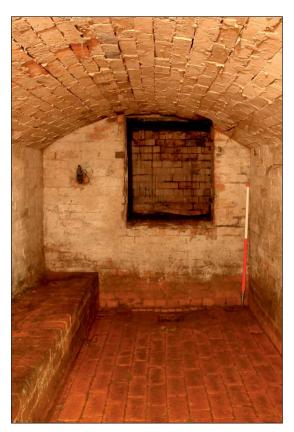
View of the lightwell, drain and tap at the north end of chamber B02, basement of Building 1
